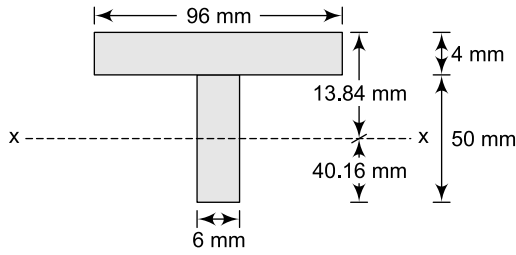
Cross Sectional Dimension of Horizontal Stiffeners (Not to Scale)
